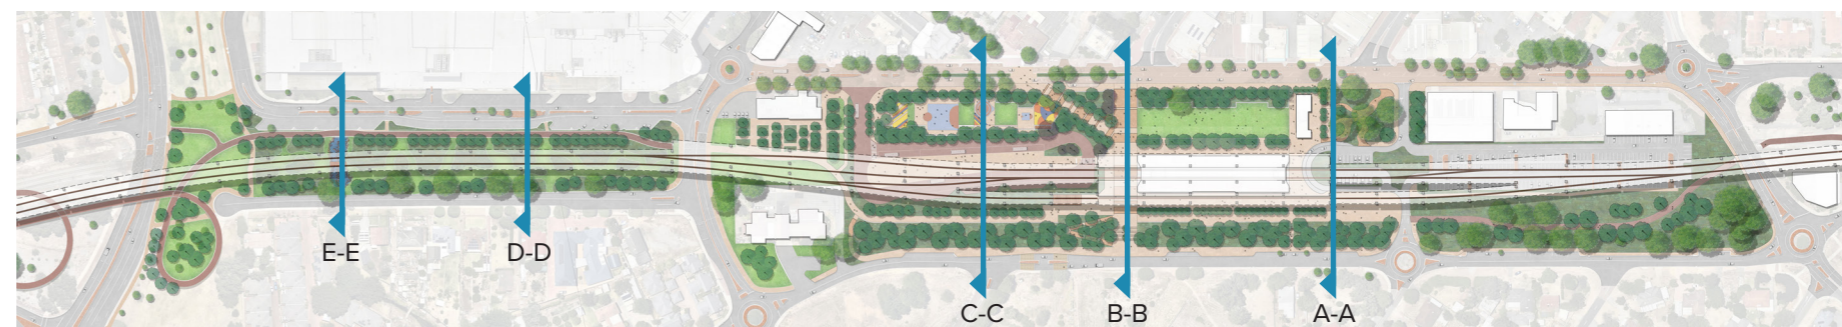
LANDSCAPE MASTER PLAN - SOUTH OF FORREST ROAD
